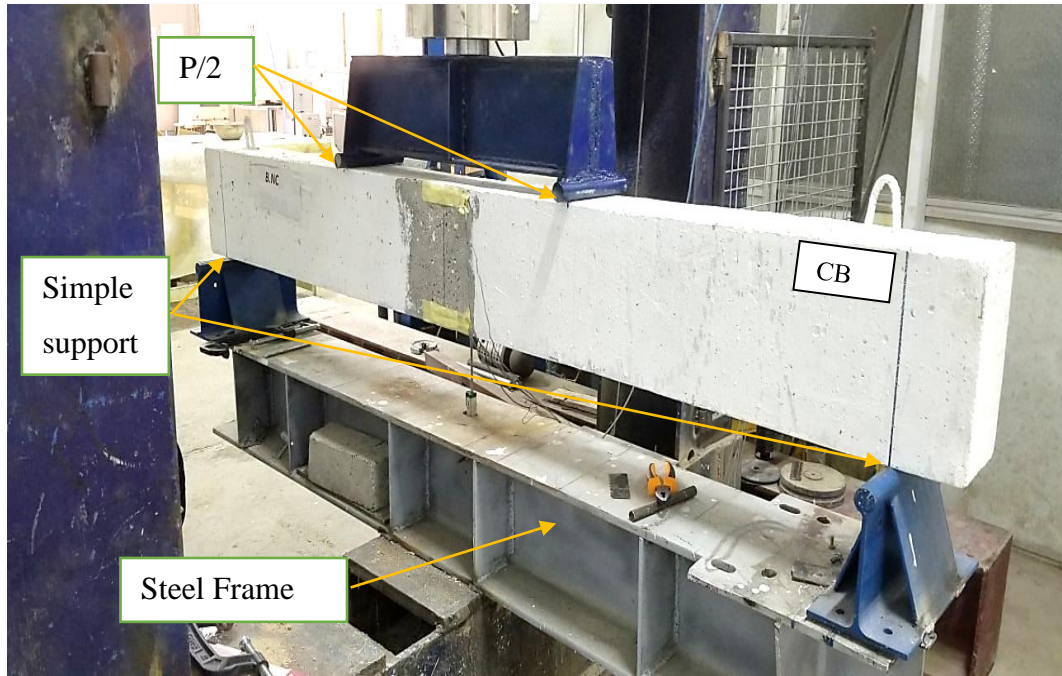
Flexural testing machine with support and loading details, (at Kerbala Construction Laboratory)
